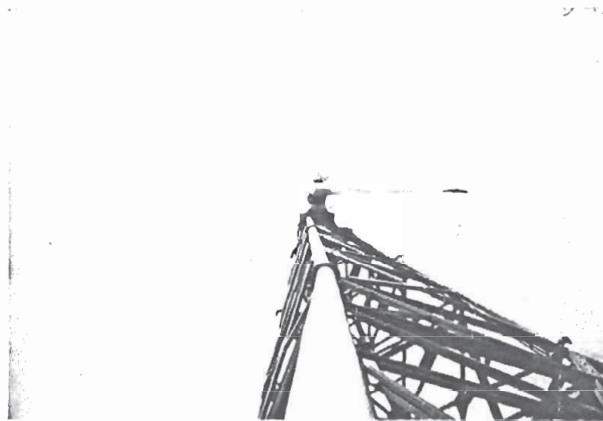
Tower Leg-to-Blade Clearance with Rotor Nominally Parallel to Southeast Flat
